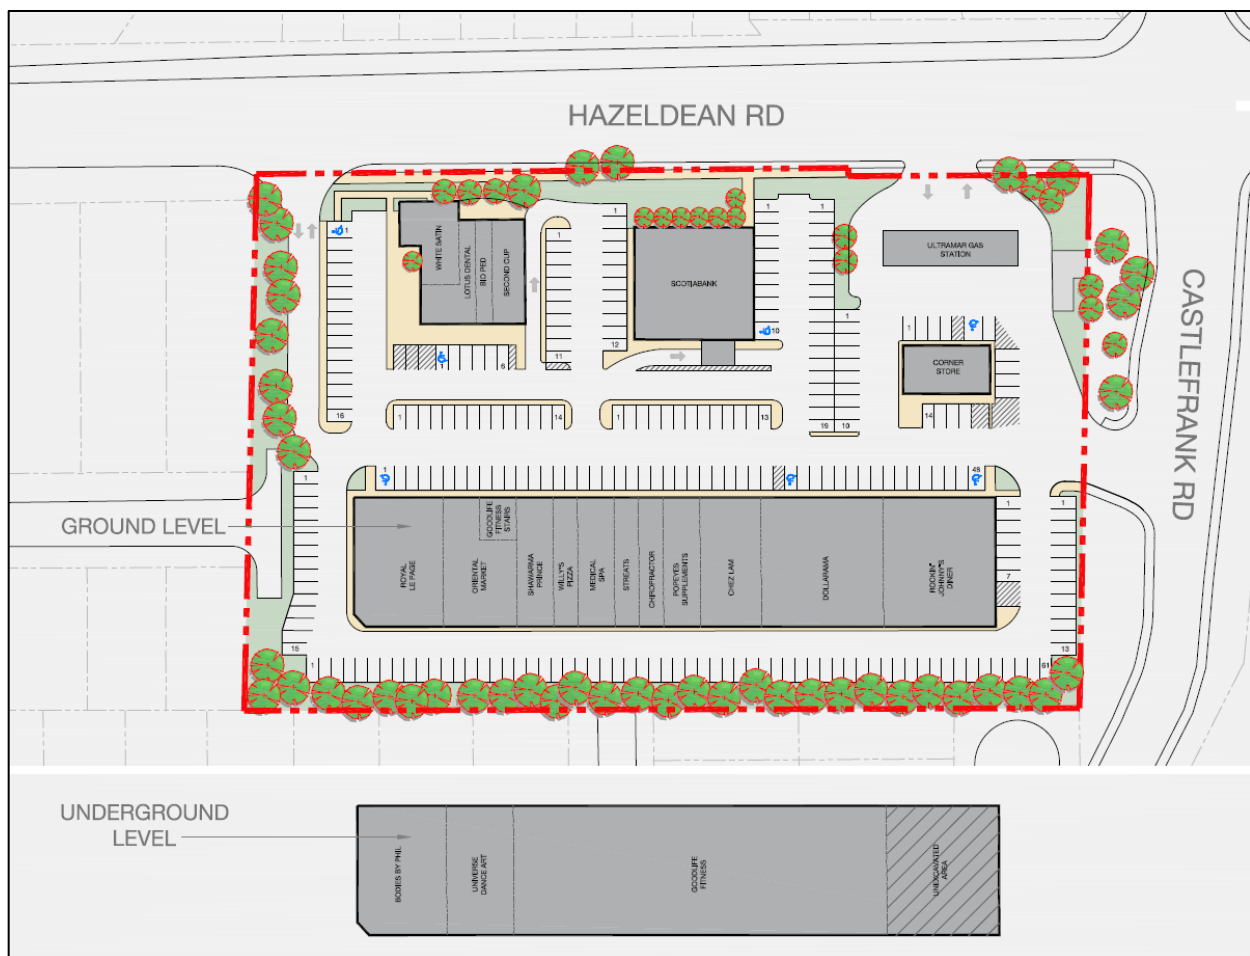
Site plan and current uses of the commercial buildings located at 484 Hazeldean Road.
